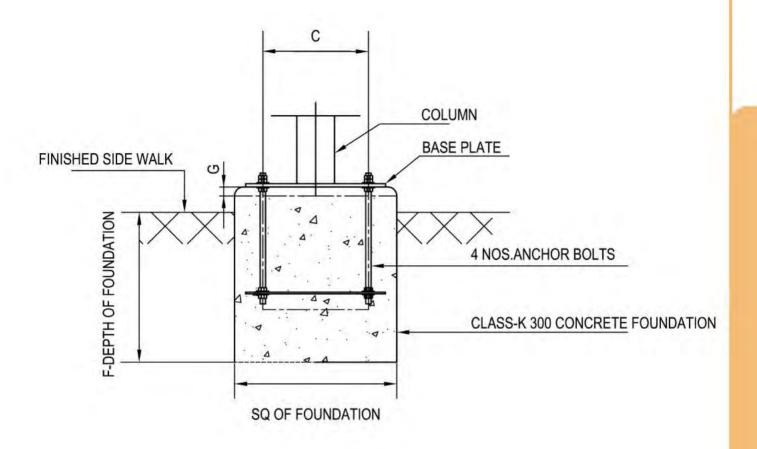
## DETAIL OF CONCRETE FOUNDATION FOR STREET LIGHTING POLE (TYPE "J")
